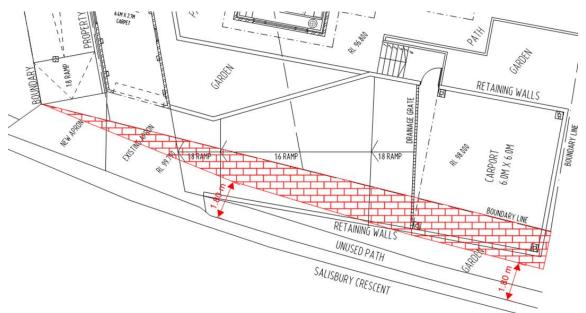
Plan of Proposed Area of Highway Closure in the Road Verge
